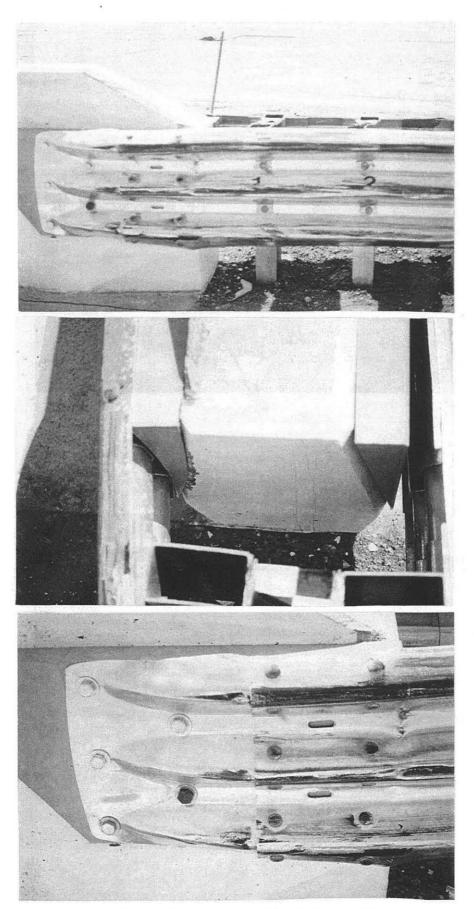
Approach Guardrail Transition Damage, Test MTSS-1 (Con't)
